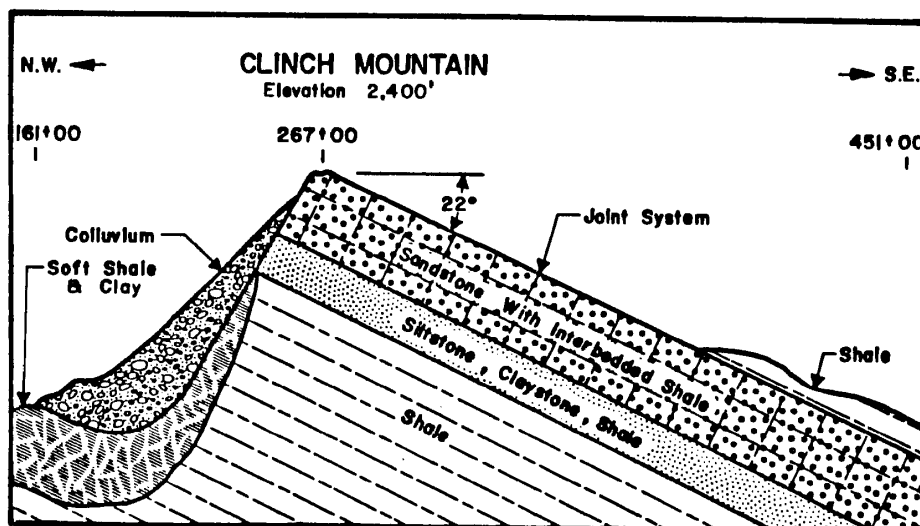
Schematic drawing through subject section of State Route 32 - Appalachian Corridor "S" across Clinch Mountain showing conditions requiring compensatory design for unstable conditions - colluvium overlying soft shale, steep slopes, adverse dips, high angle joint systems, weak shale seams interbedded with thick more competent sandstone strata. (Aycock, 1978) (Reference 26)
